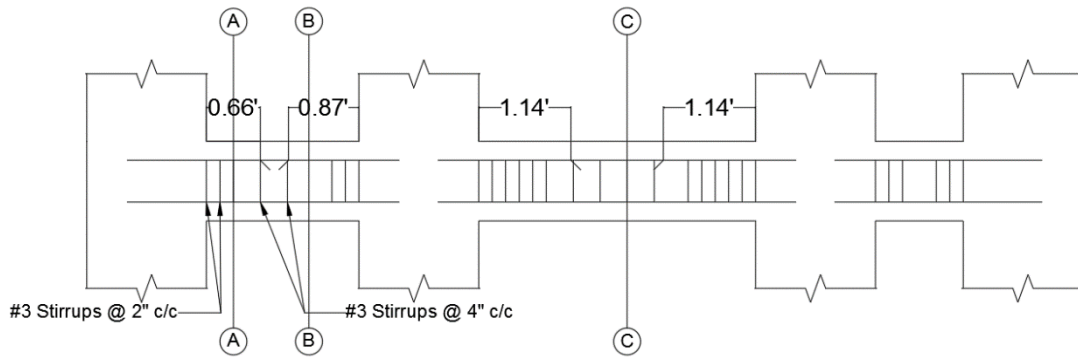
Beam rod detailing for Y-axis GF-2F
